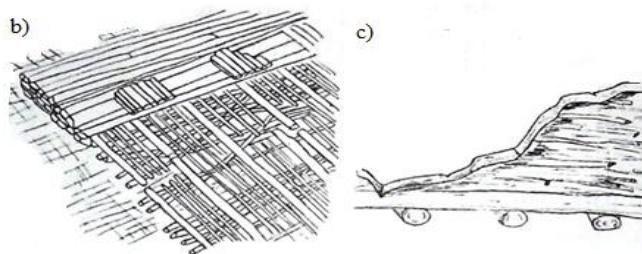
Different kinds of lake-dwelling house floors: b) multi-layered roundwood floor build directly on the ground; c) wooden floor paved with clay (Drawing: Olenka Dmytryk) (from Menotti 2012: 134, figure 4.3).
